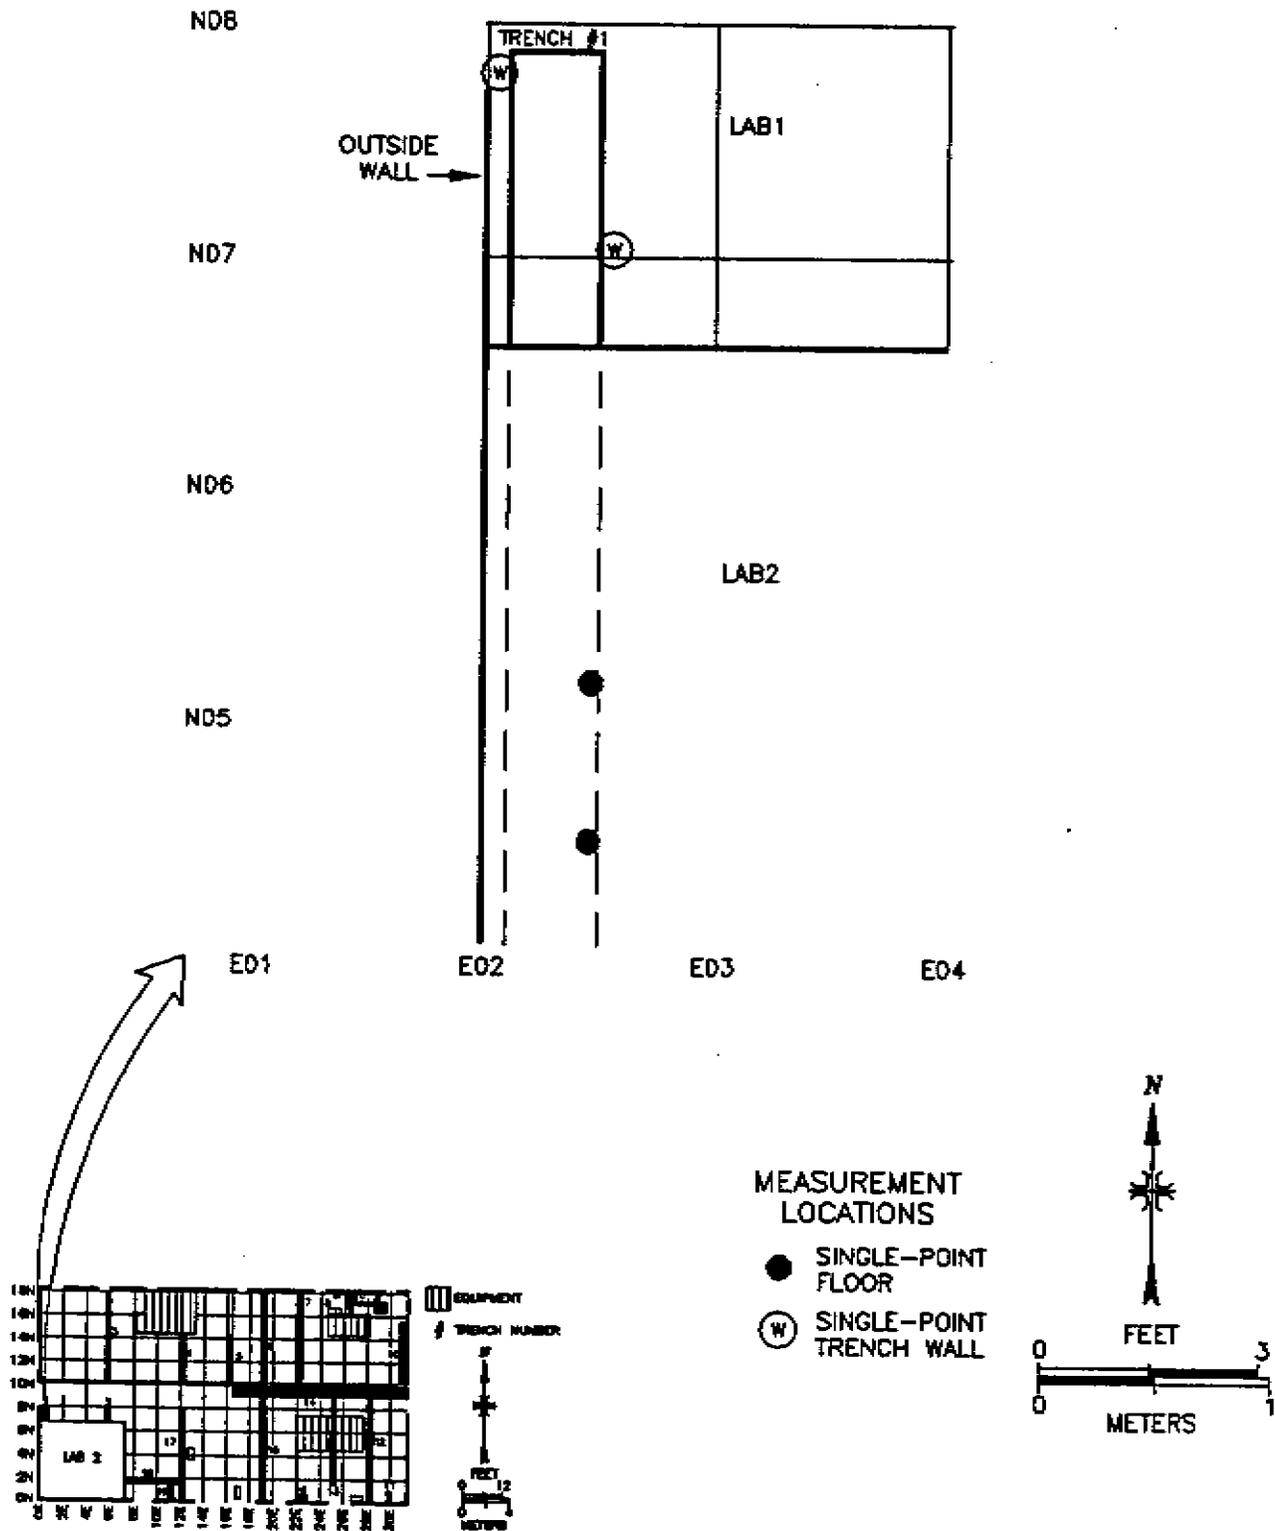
Building 23, Lab 1, Trench 1, Indicating Measurement Locations
